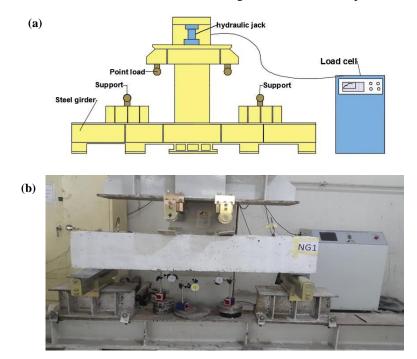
Test Setup (a) Schematic diagram for testing Machine (b) Actual Beam Specimen under Testing
